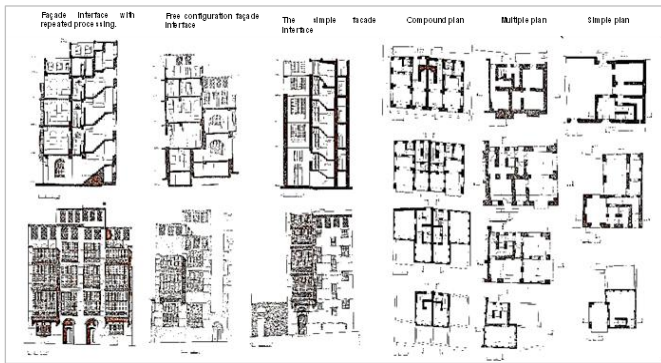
Plans and façades typologies. (Hajj Research Center, 1411 AH).
